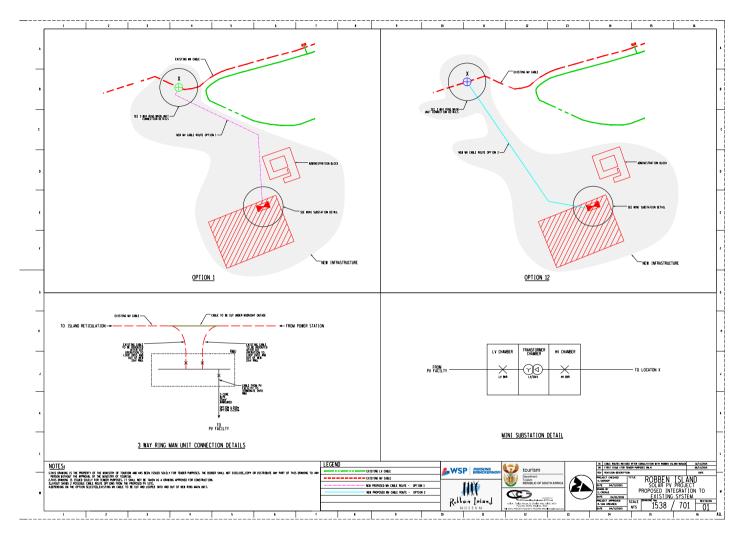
Proposed layout for site Alternative 2 - The agricultural site, with proposed new power cable lines to connect to existing. Fibre optic cables will be installed to connect the solar plant with main power plant along the same route. (As provided by WSP|PB January 2016)
